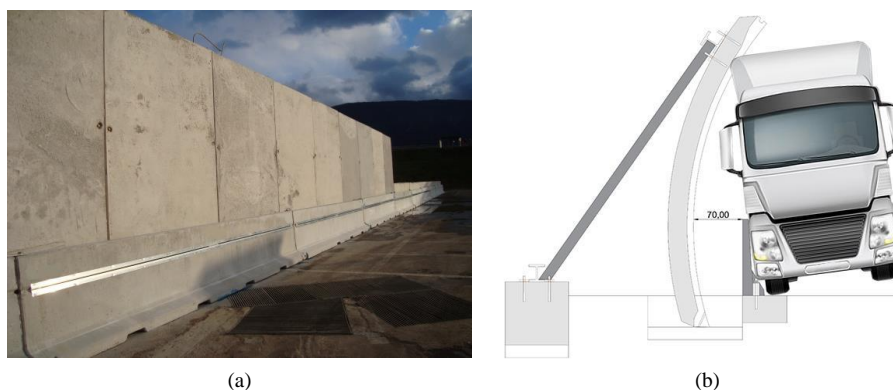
a) Common test conditions of barriers for road tunnels; b) Layout used for testing the “NDBA Tunnel” barrier
